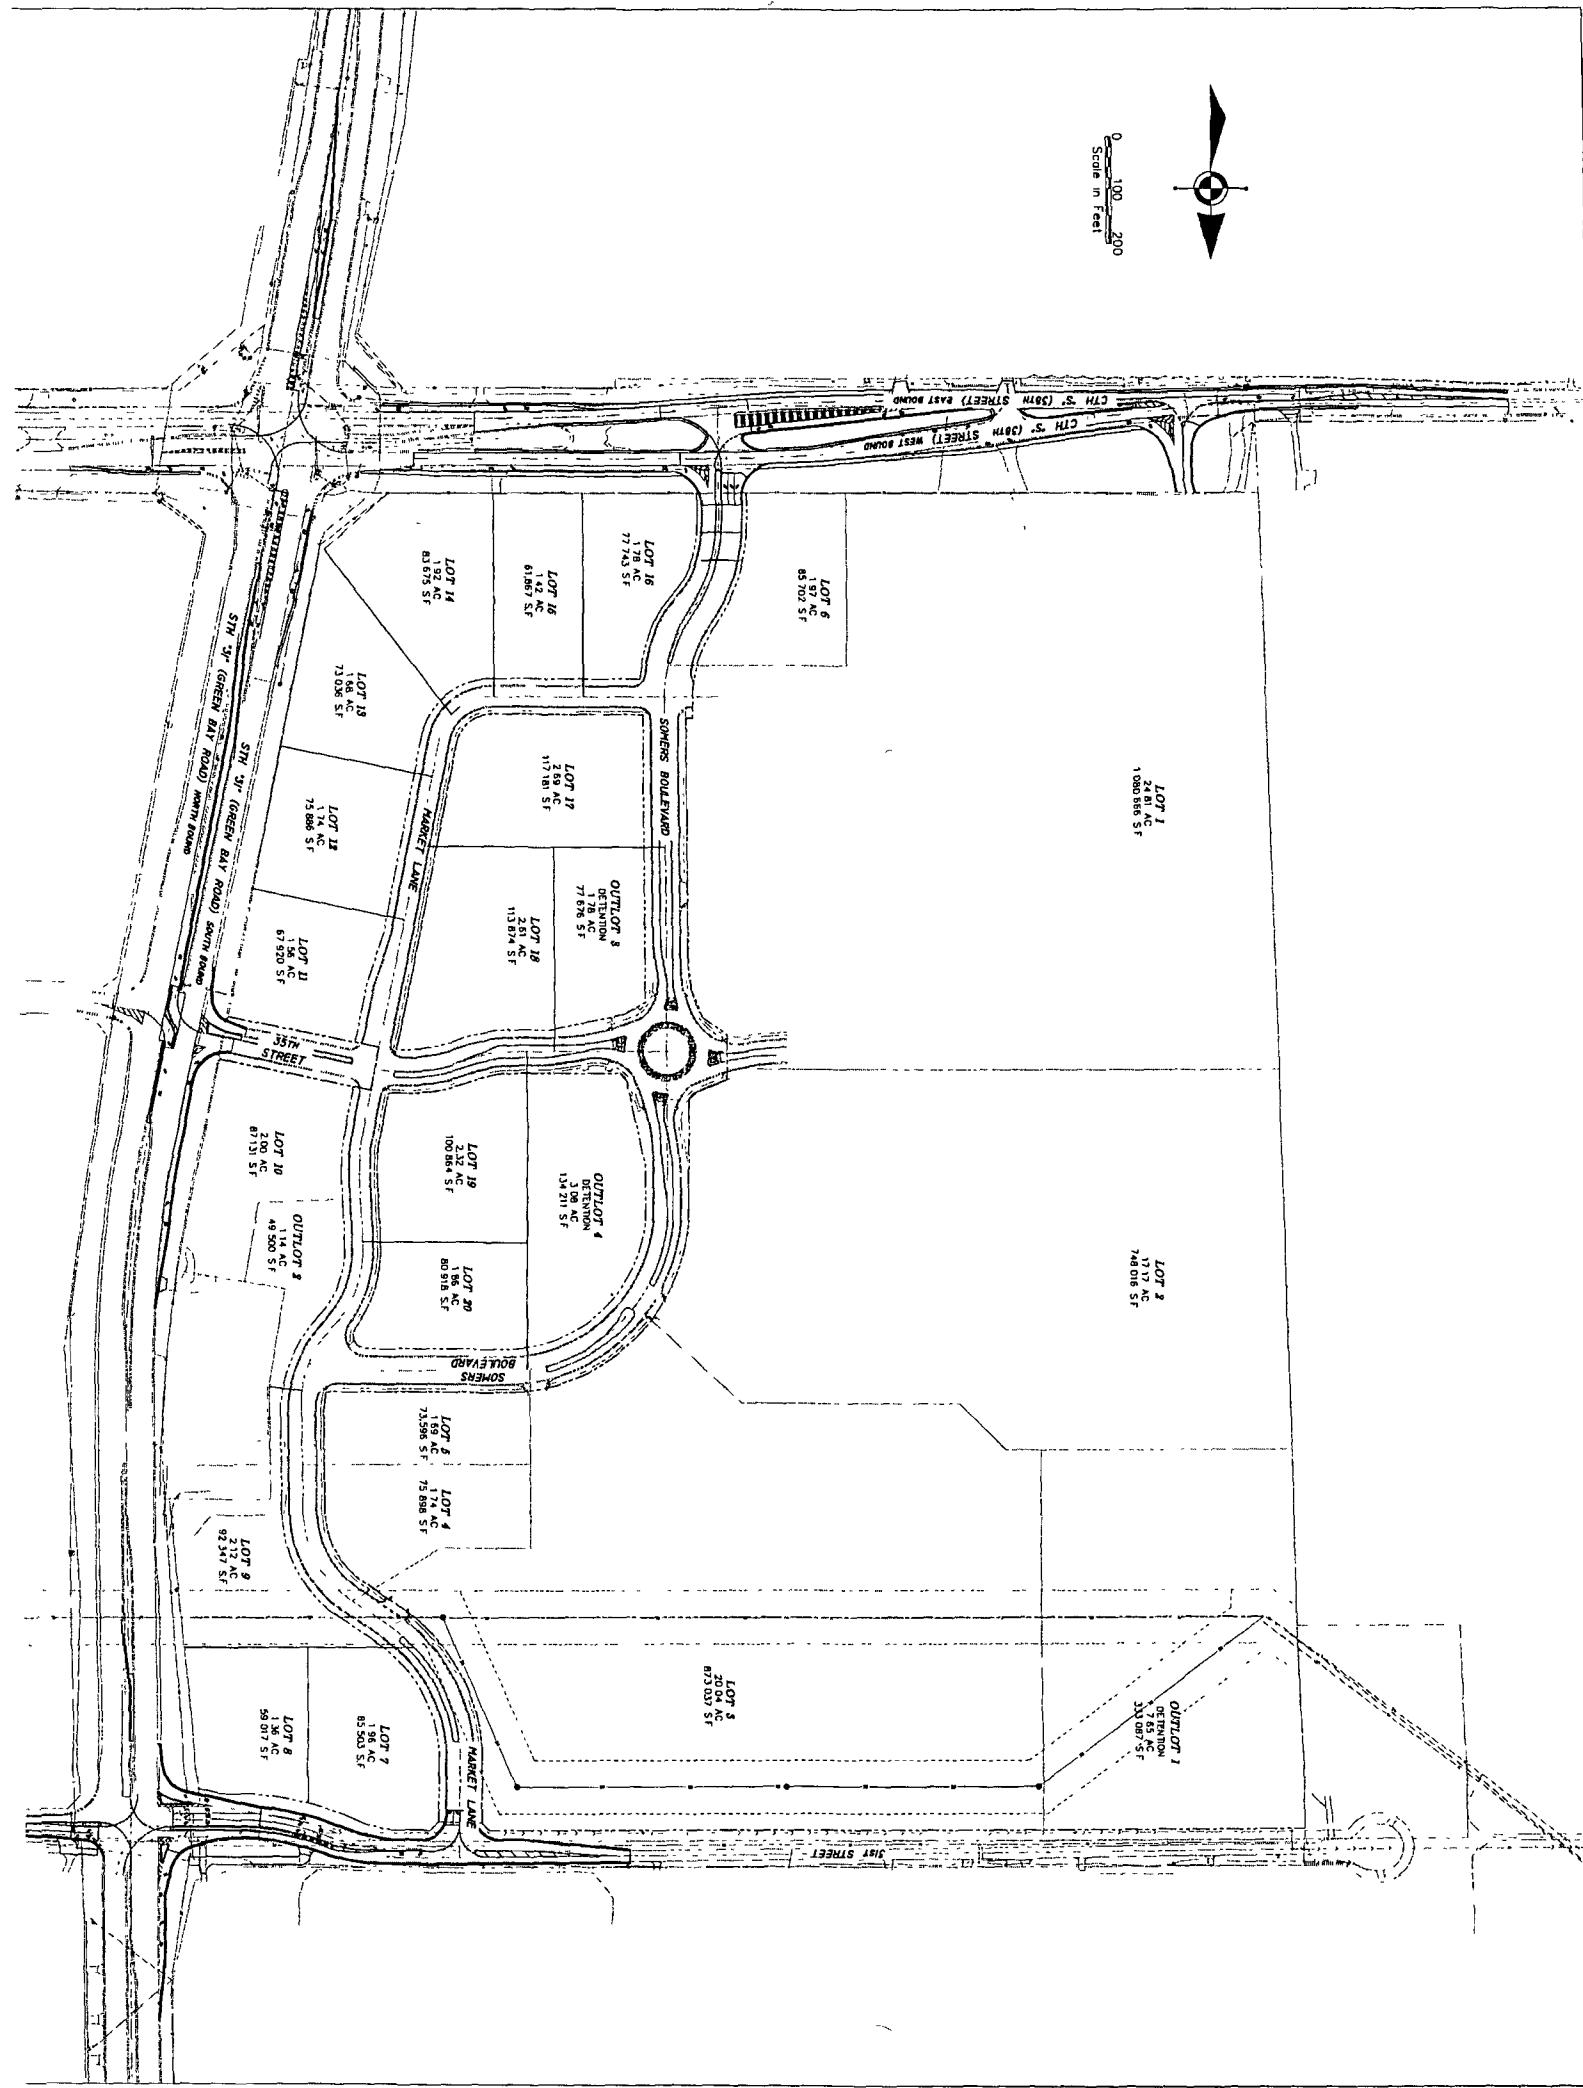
EXHIBIT C - SUB OFF-SITE IMPROVEMENTS PLAN
